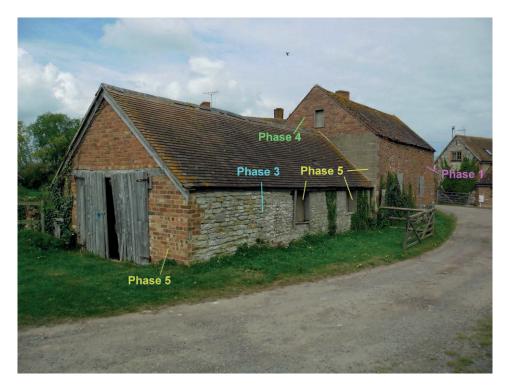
View looking N showing SW gable and SE facing elevation of Barn C
